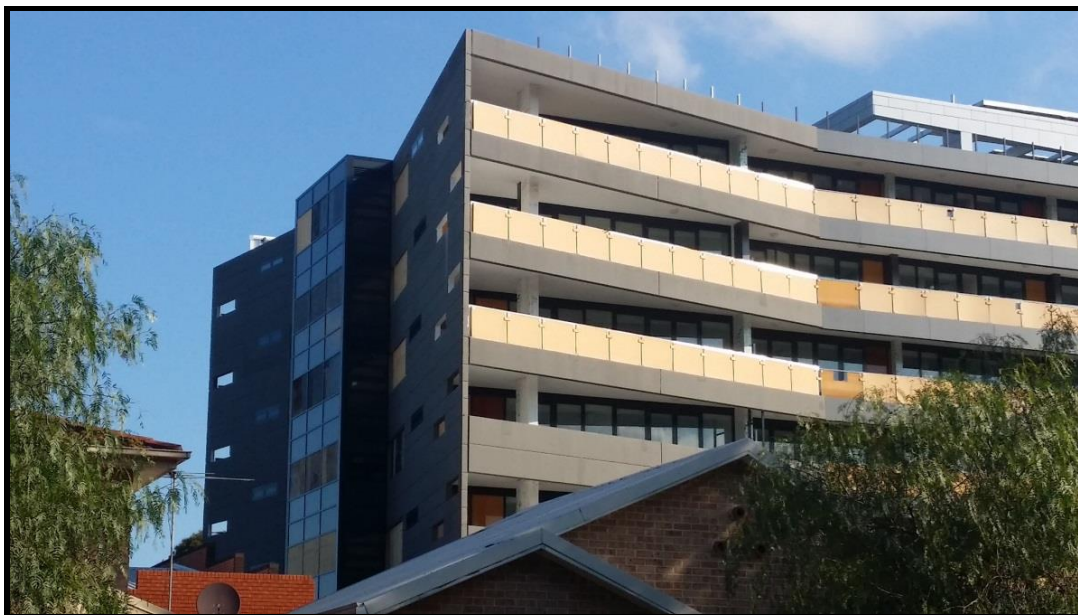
Photograph of the subject site with the approved building under construction showing an oblique view of the western elevation from Robey Street.
